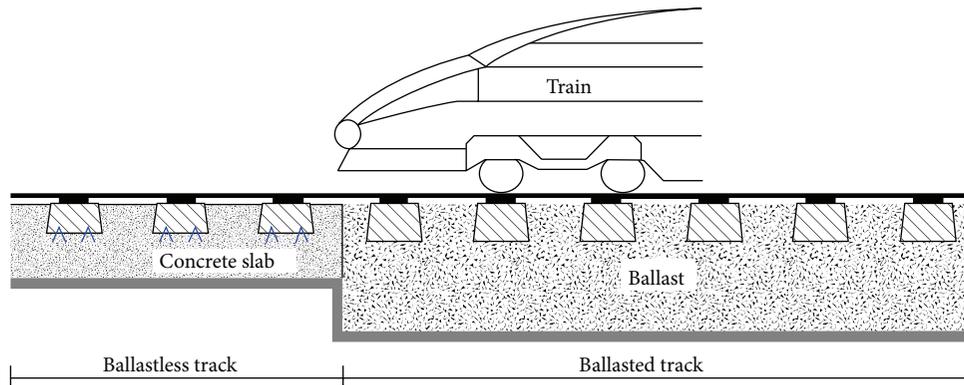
A schematic layout of the railway ballastless-ballasted transition.
